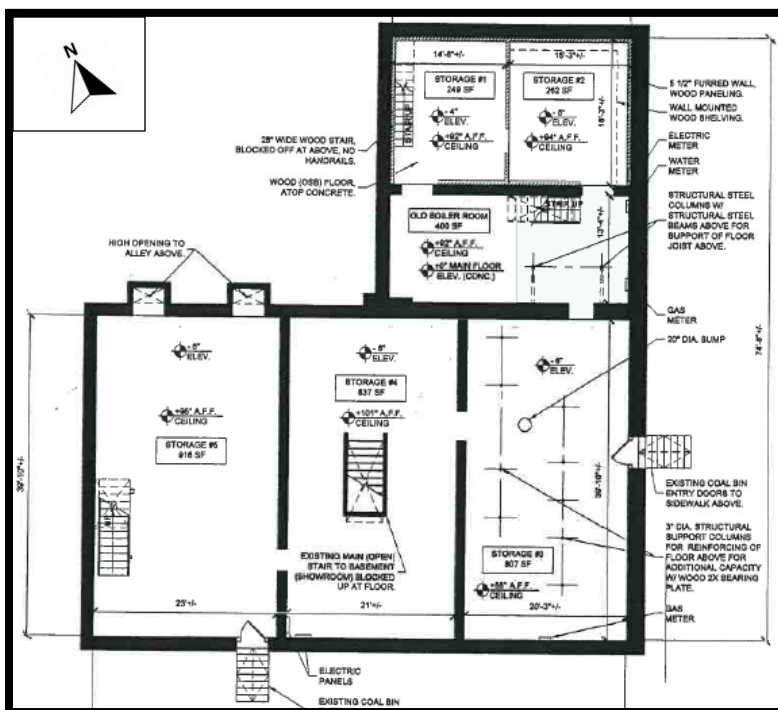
635 6<sup>th</sup> Avenue, City Hall, Basement Floor Plan
